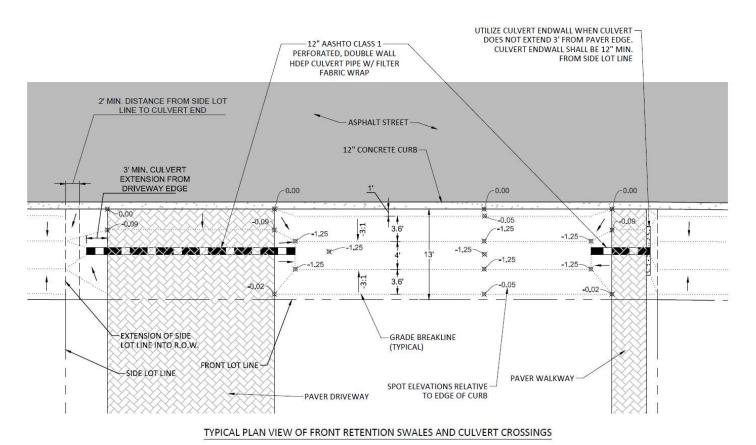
Typical Plan View of Front Right of Way Grading and Drainage
